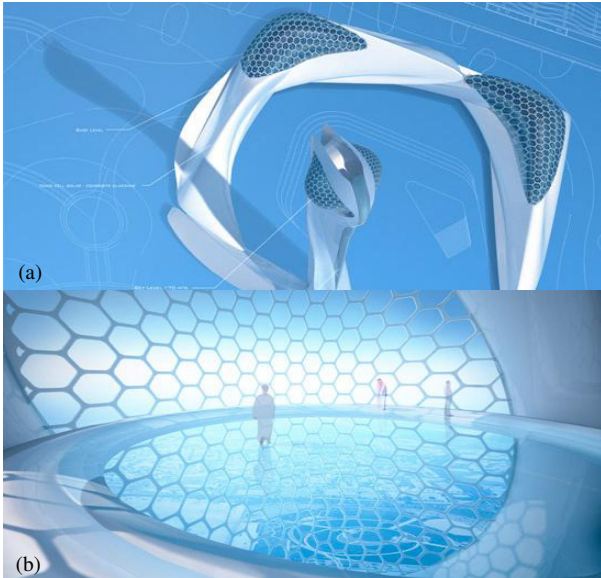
Utopia One tower [14]: a- Site plan. b- Interior view.
